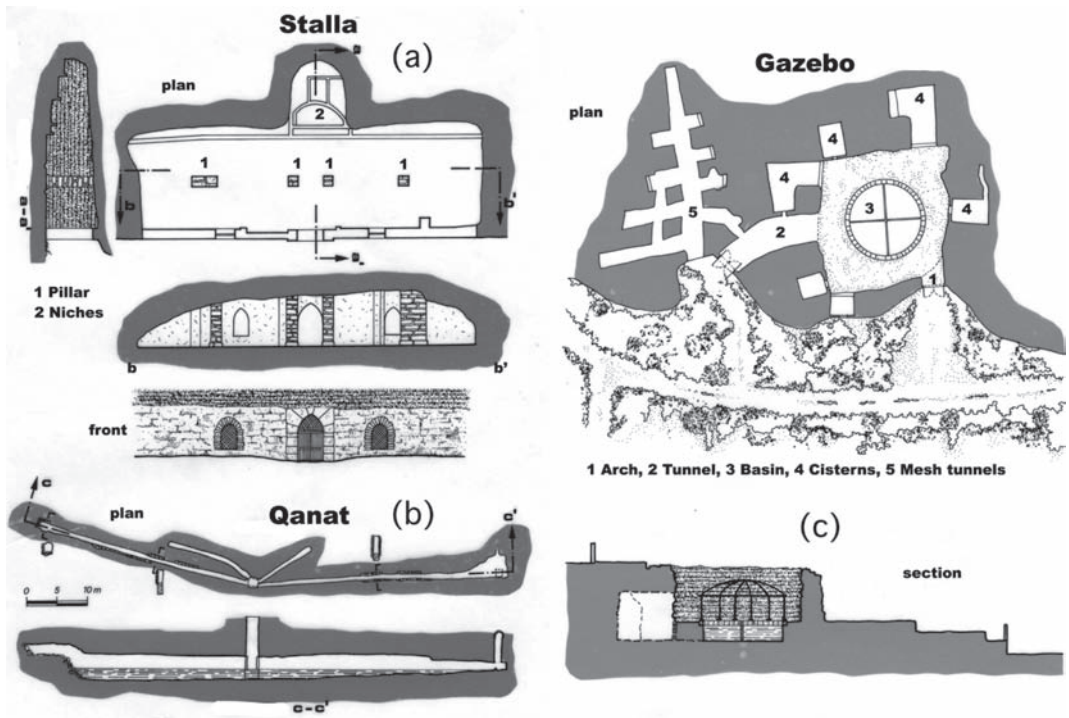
Plans and sections of the main Hypogea a) Stalla; b) Qanat; c) Gazebo and “mesh” tunnels.
